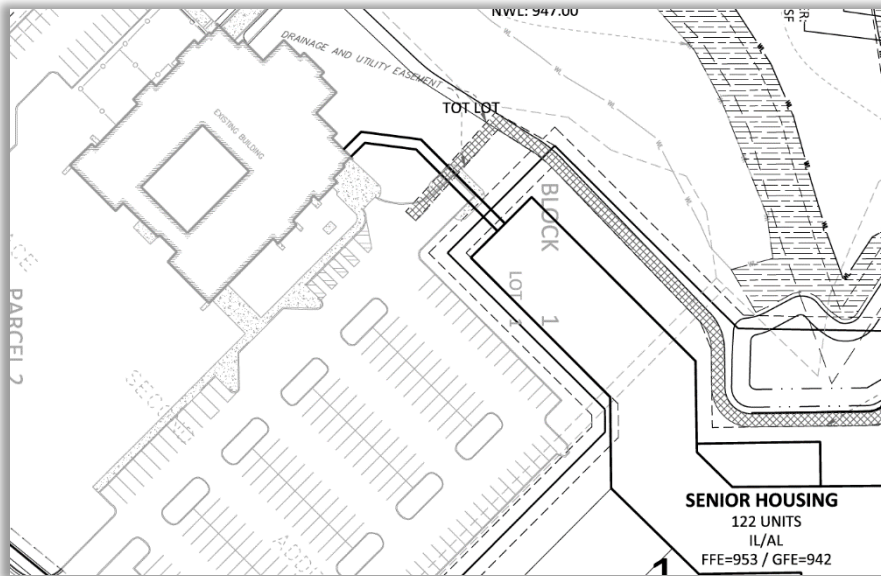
Tunnel Connection Between Church and Senior Housing Building
